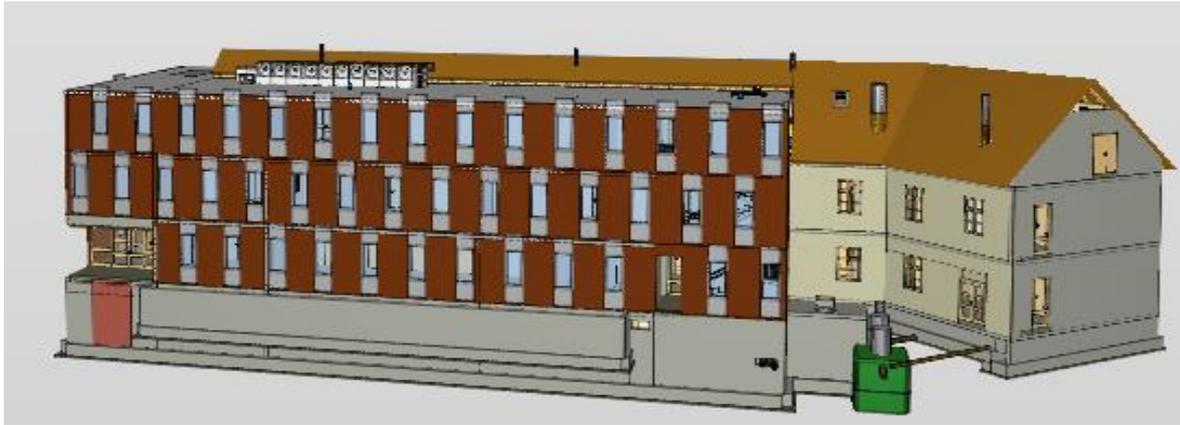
Federated 3D BIM Models (architectural, structural, and ventilation models)
